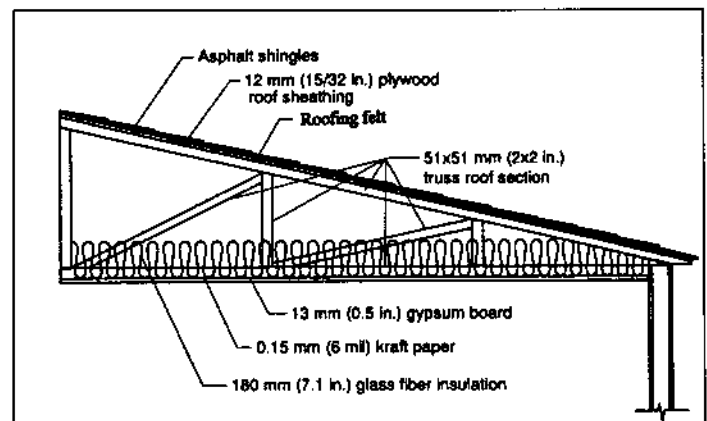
Half cross-section of roof cavity of double-wide manufactured house.
